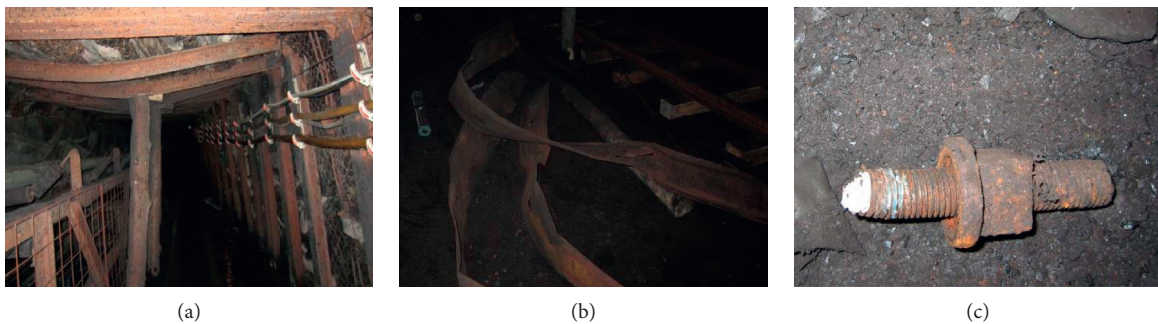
Current status of roadway support. (a) Roof subsidence. (b) Falling steel band. (c) Broken rock bolt.
